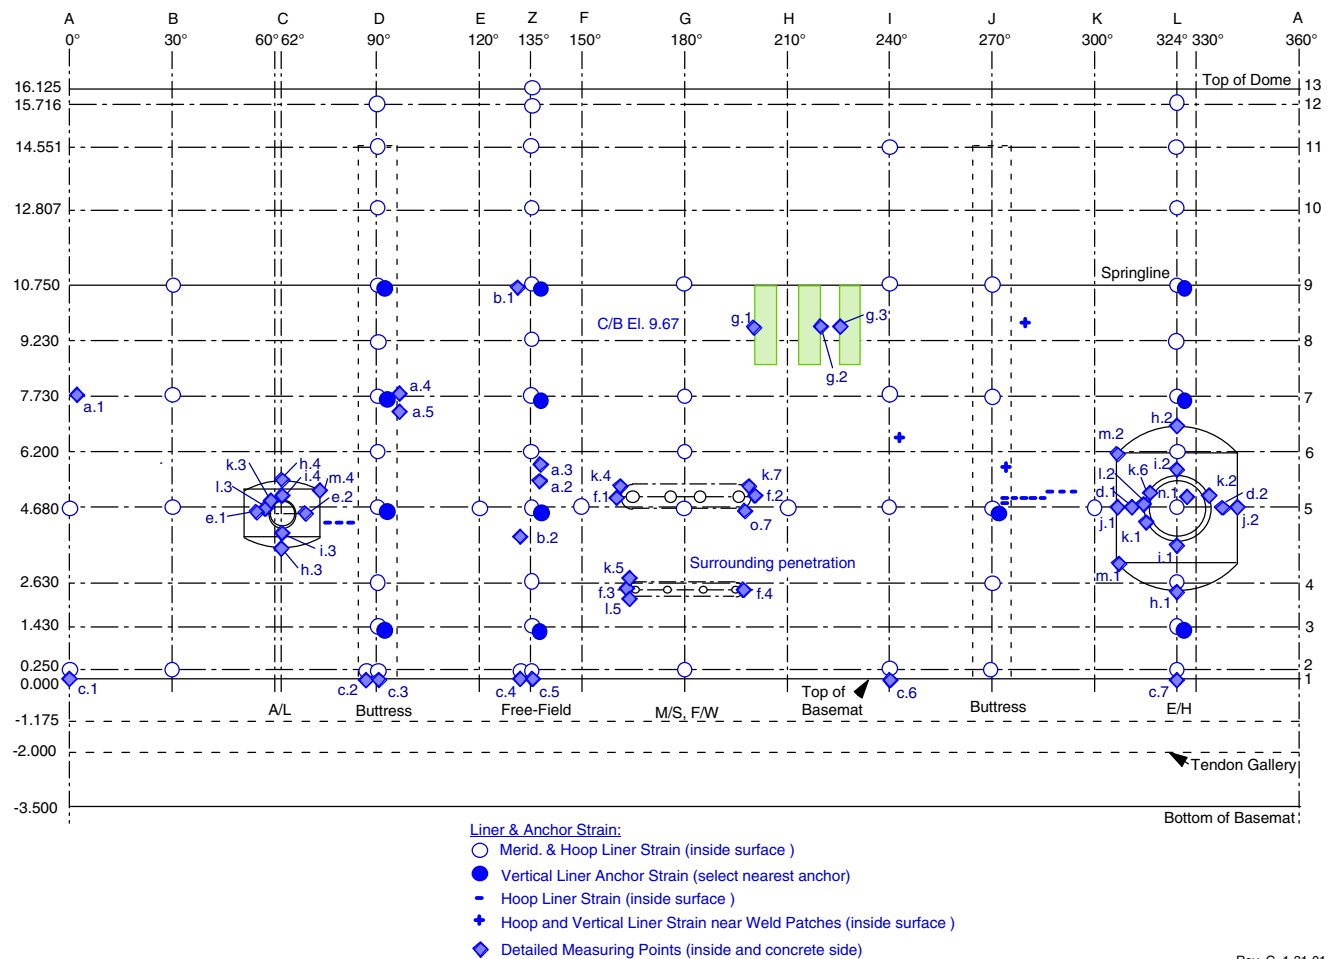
Liner and Liner Anchor Instrumentation Locations
